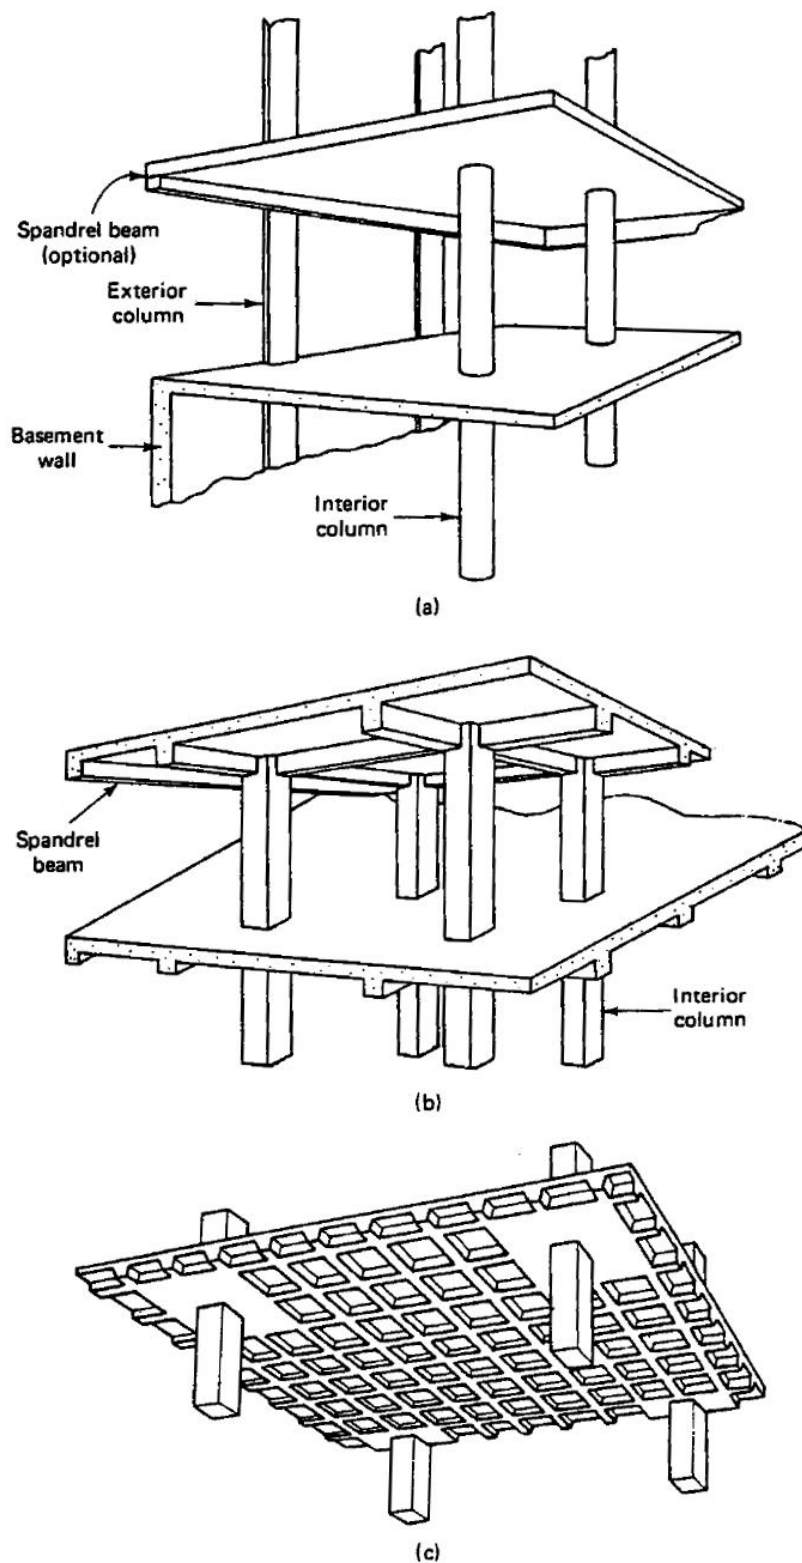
Two-way-action floor systems. (a) Two-way flat-plate floor. (b) Two-way slab floor on beams. (c) Waffle slab floor.
